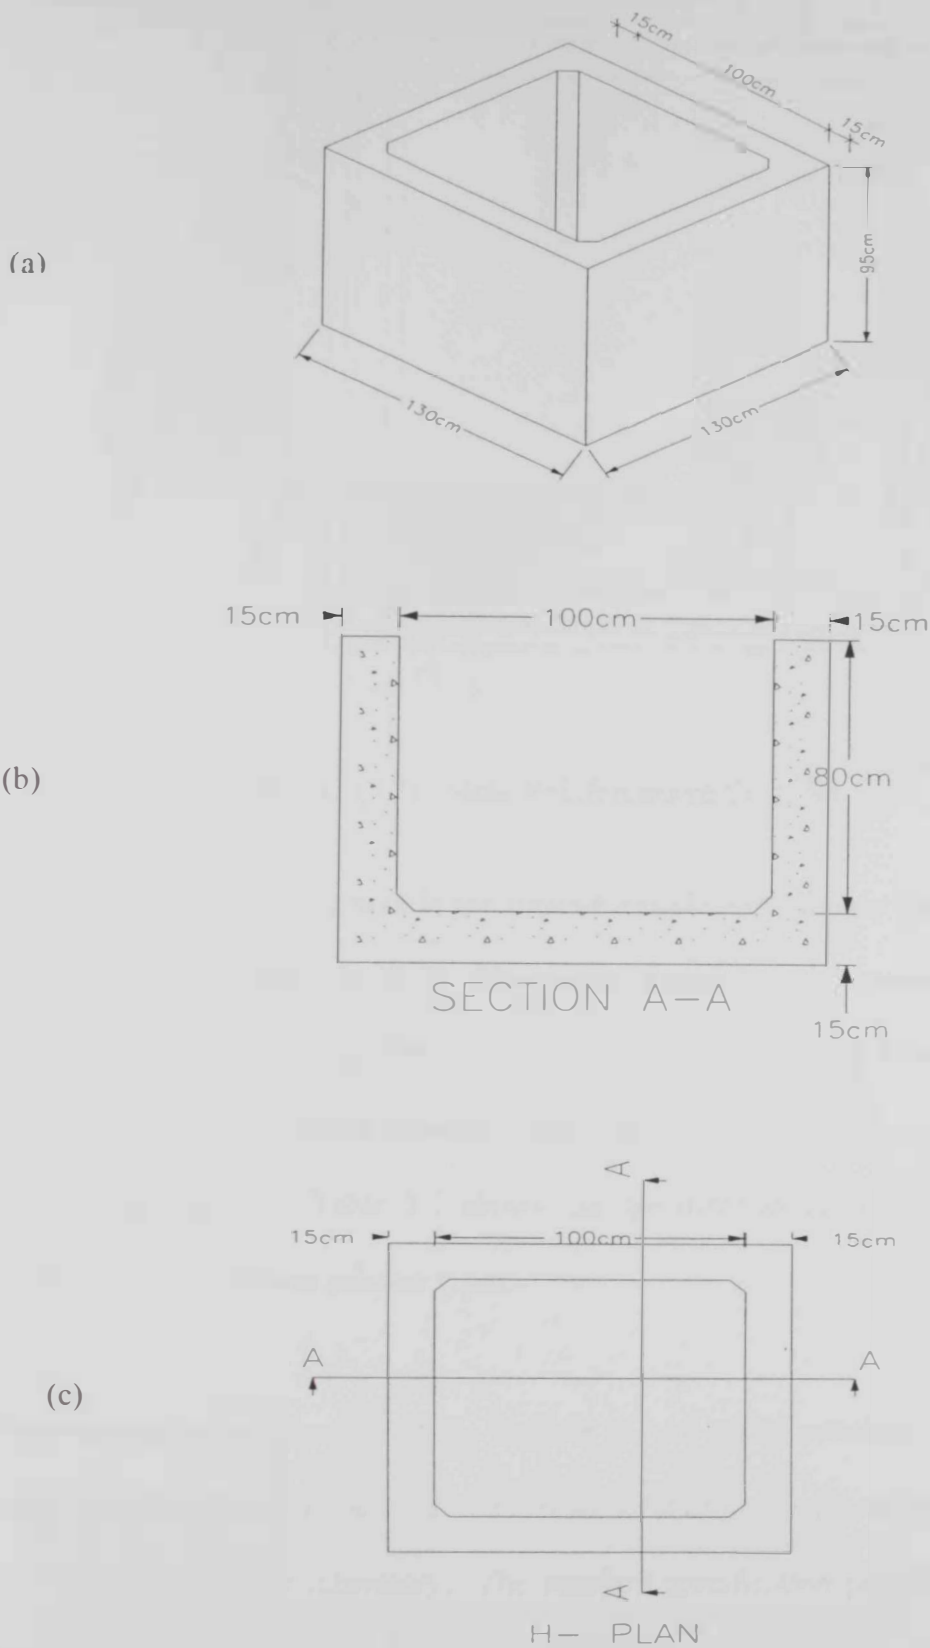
Mold Used in Testing: (a) Dimension Details, (b) Horizontal Plan for the Mold, (c) Cross Section of the Mold
